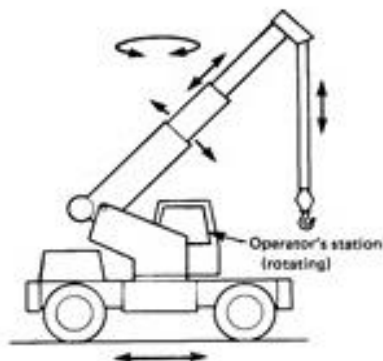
WHEEL-MOUNTED CRANE — TELESCOPING BOOM (SINGLE CONTROL STATION)
